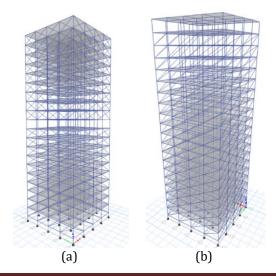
Soft storey models of 20 storey building at (a)Middle storey (b)Top storey
